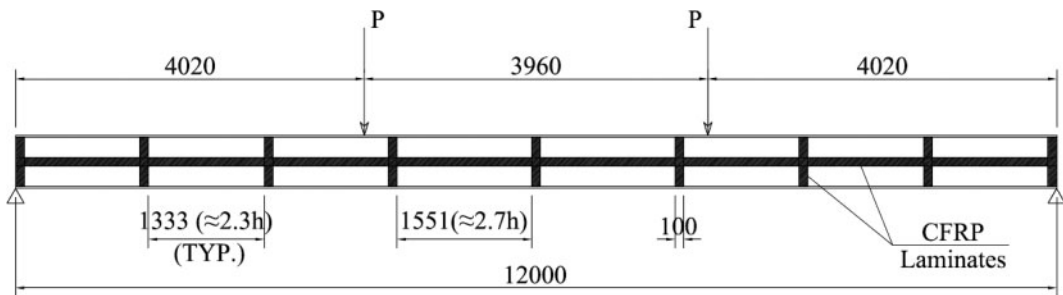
Strengthened steel beam: loading, boundary conditions and CFRP laminates configuration.
